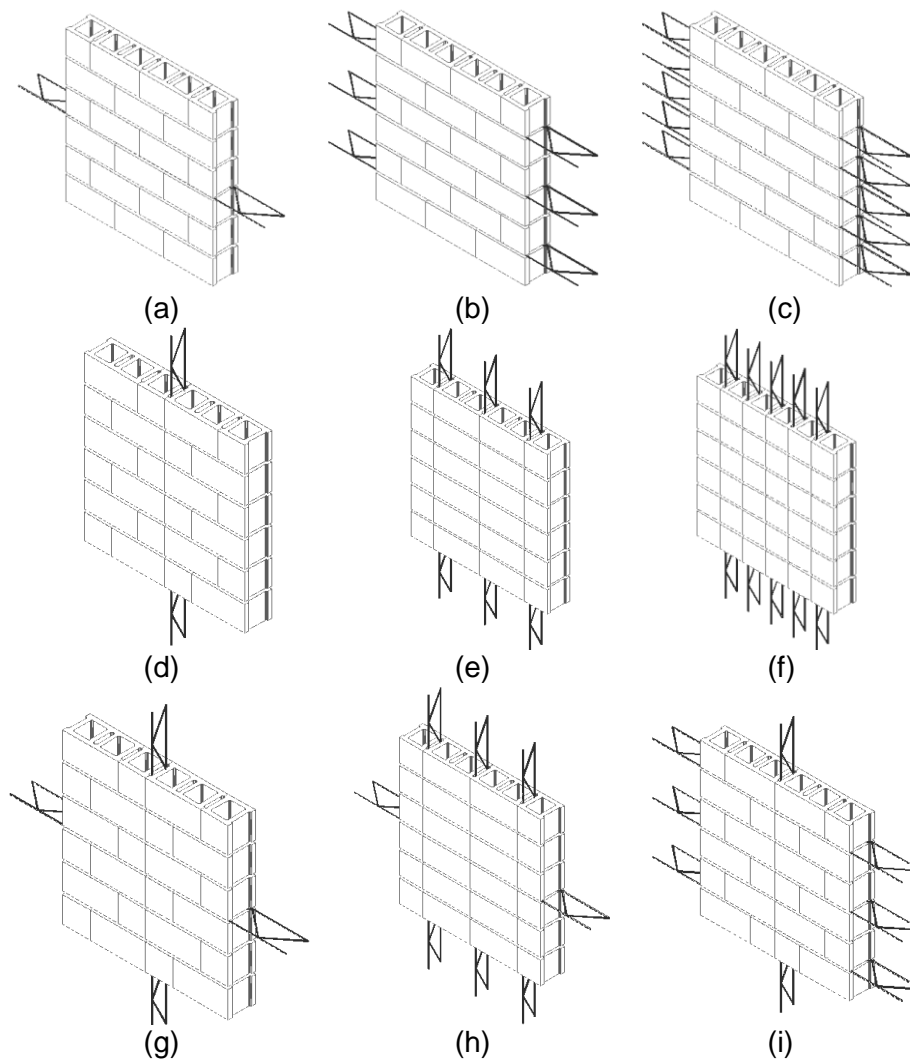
Reinforcement arrangements for the vertical and horizontal reinforcements; (a) specimen HRM1; (b) specimen HRM2; (c) specimen HRM3; (d) specimen VRM1; (e) specimen VRM2; (f) specimen VRM3; (g) specimen VHRM1 (h) specimen; VHRM2; (i) specimen VHRM3.
